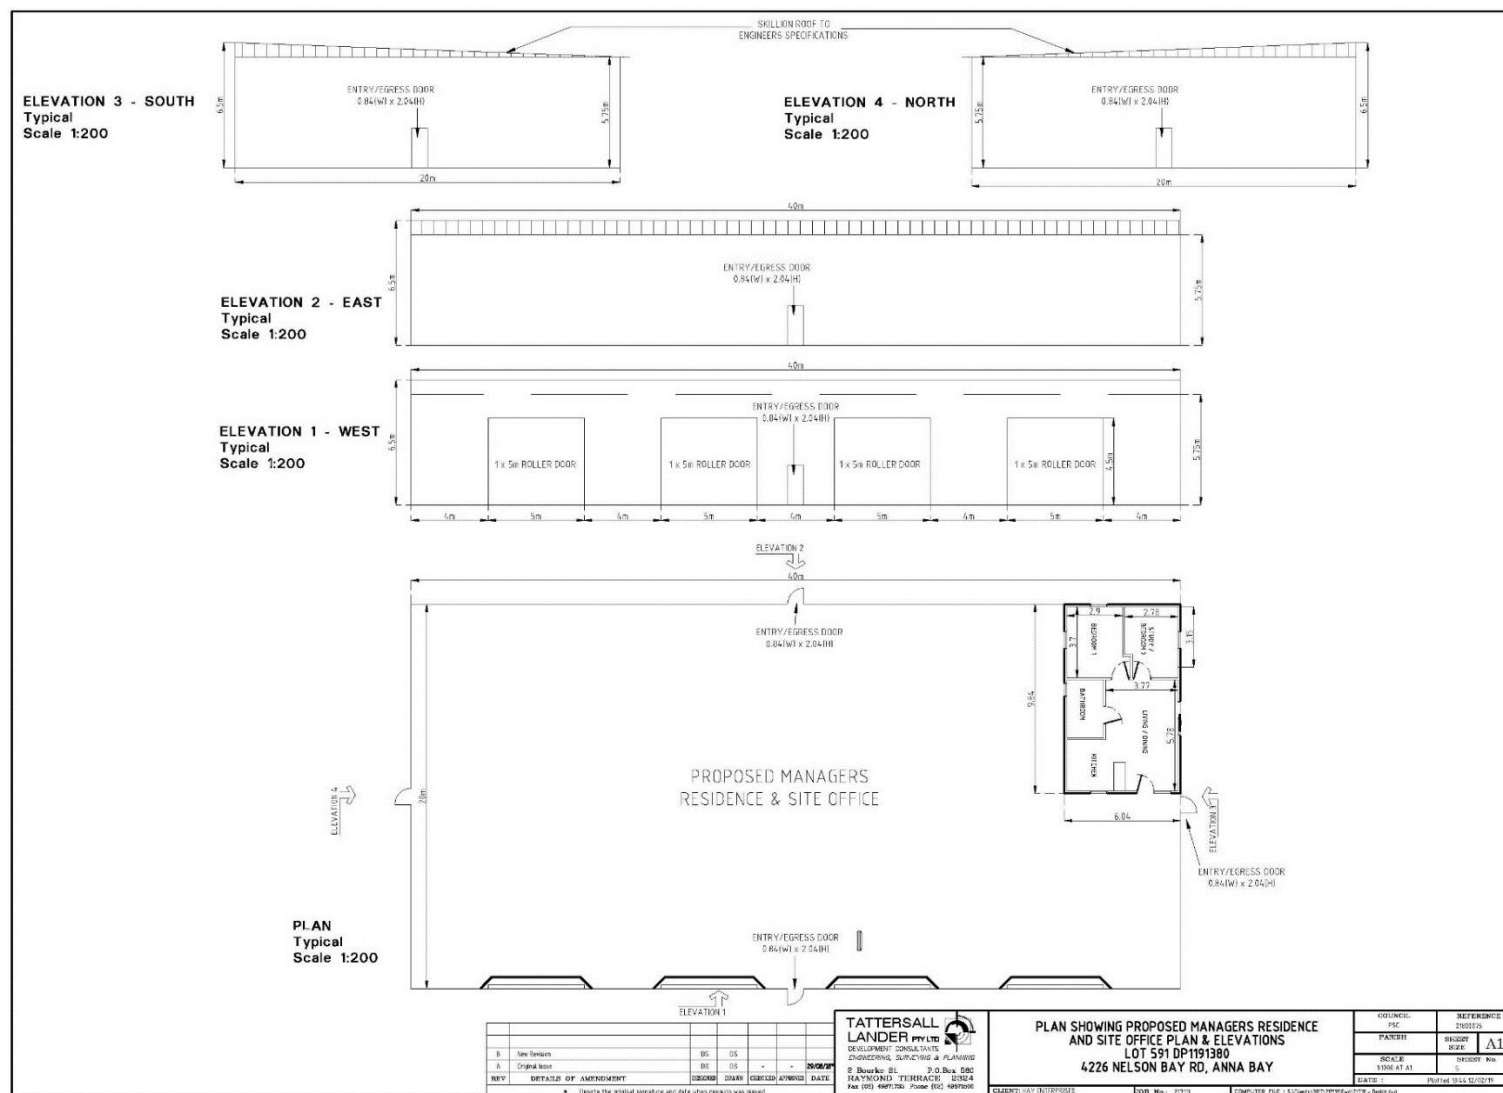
Floor Plans & Elevations: Site Office and Manager's Residence
